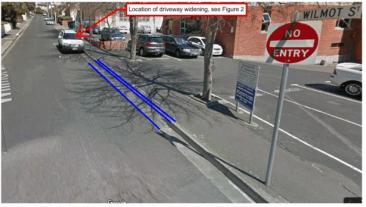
Existing Driveway on Wilmot Street to be removed and new kerb and channel installed
